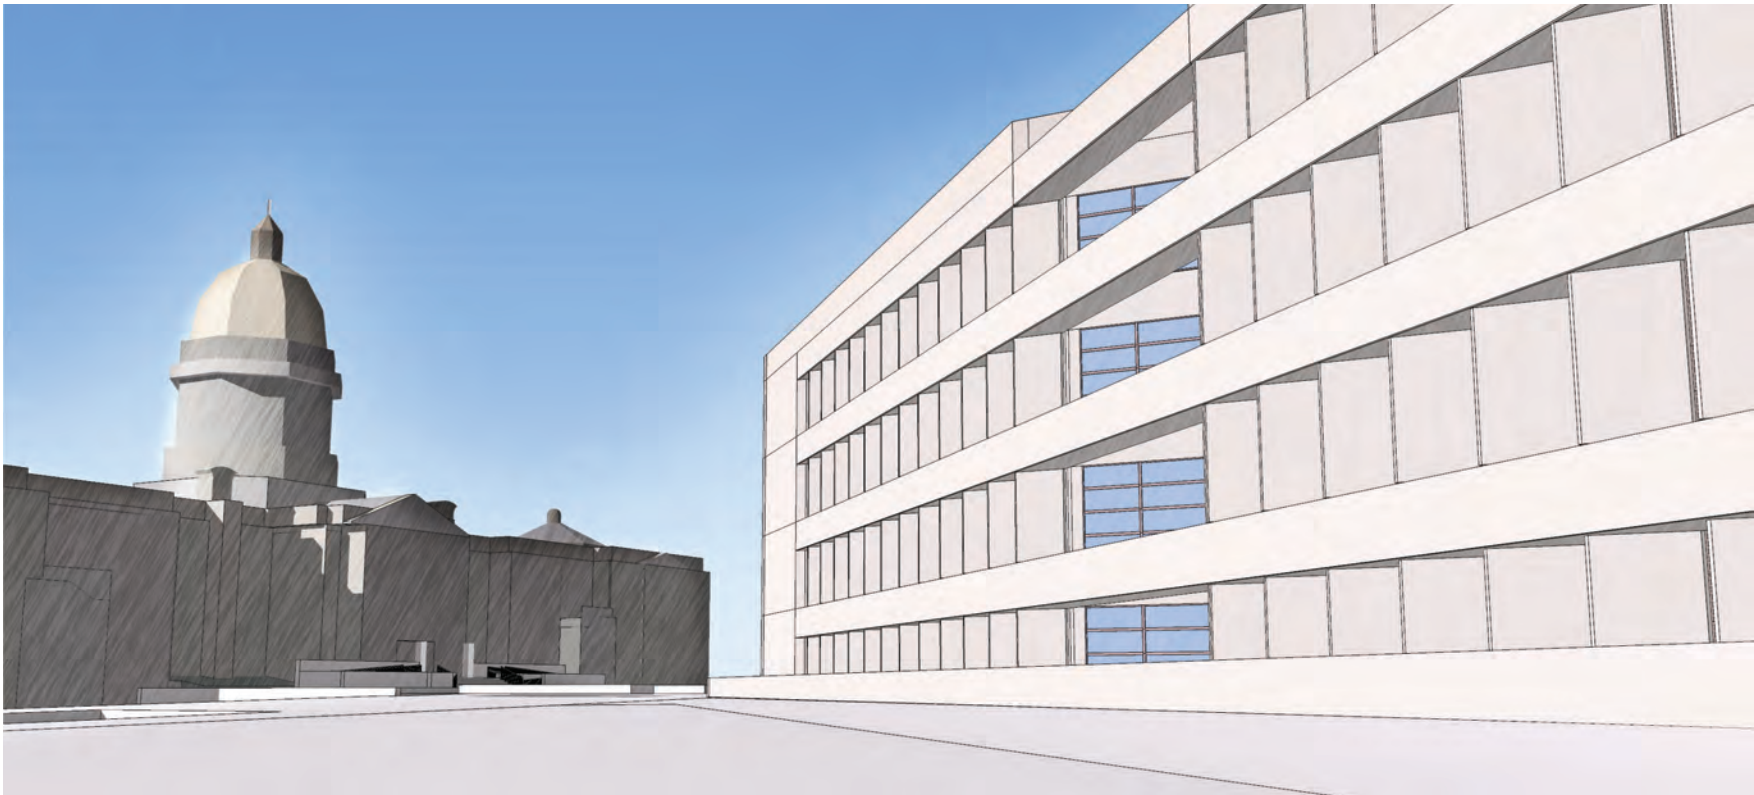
Perspective 2 - Existing Herschler Building - East Elevation Looking South East
